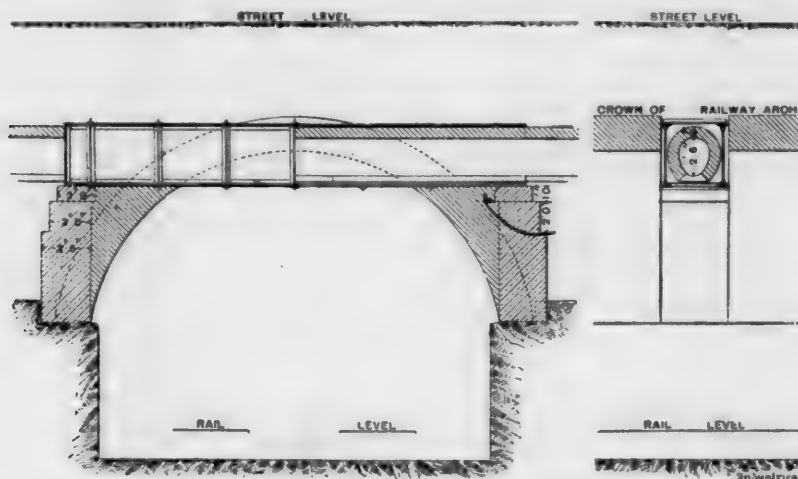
TRANSVERSE SECTION OF COVERED WAY No. 6, BRIDGTON SECTION
